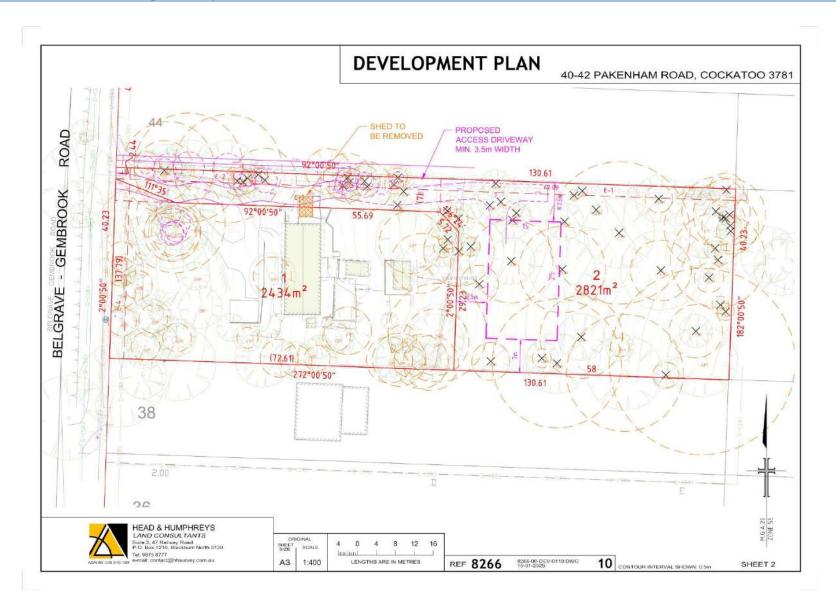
The proposed development plan for 40-42 Pakenham Road, Cockatoo.
